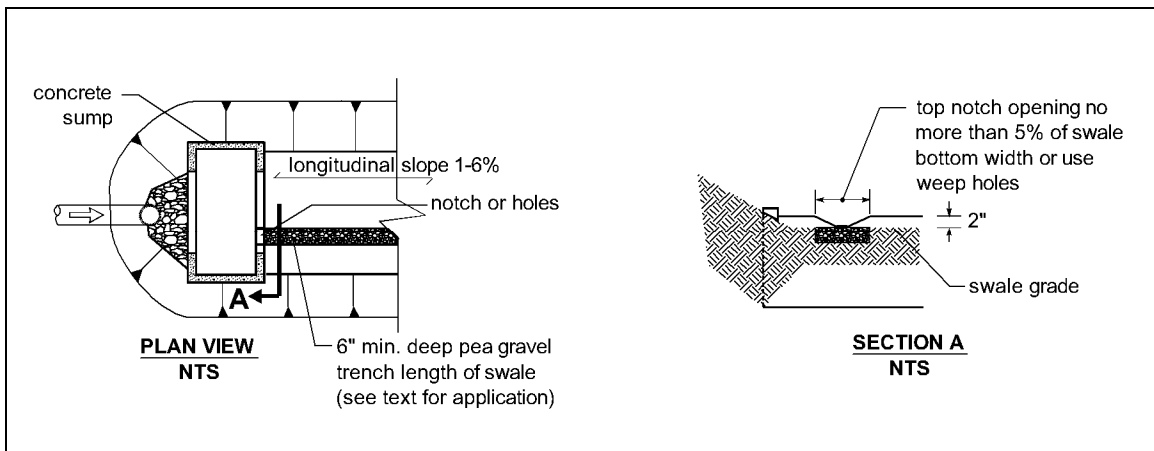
Biofiltration Swale Low-Flow Drain Detail
